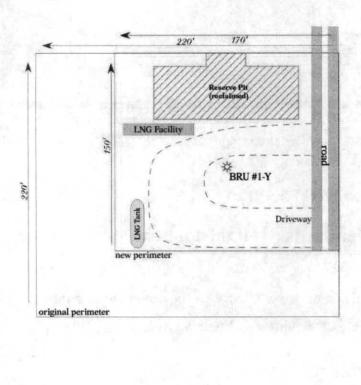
Proposed layout of mini-LNG Facility and storage tank.
